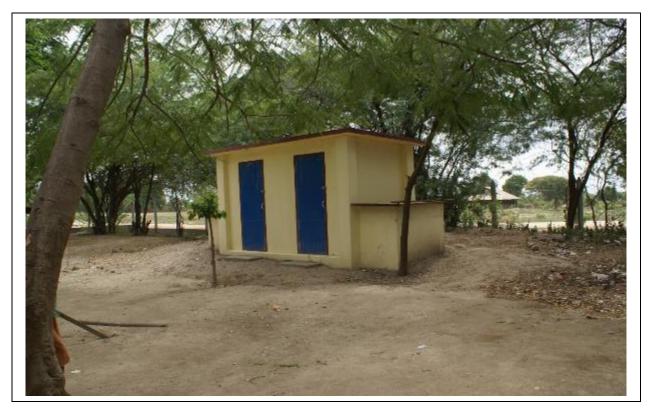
Sa Khar Village: New toilets built at the primary school, a Sembcorp/PCo CDP Project
